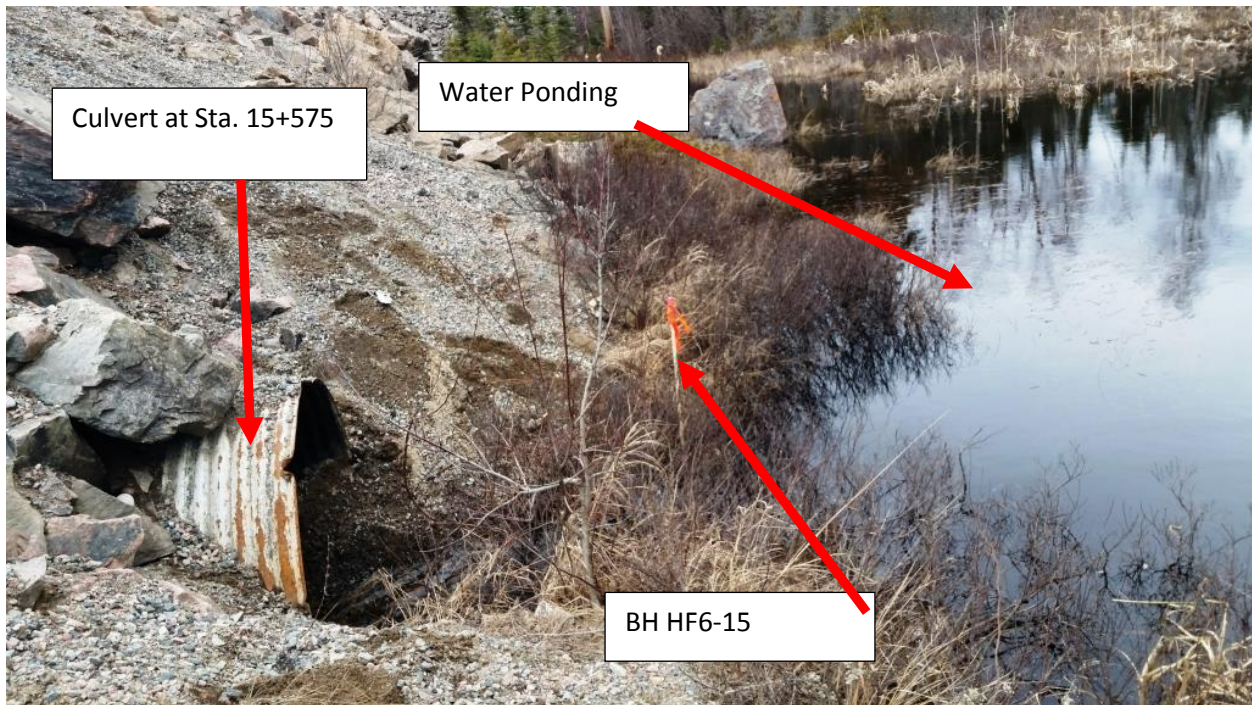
Looking toward west - Culvert and Water ponding (April 2017)
